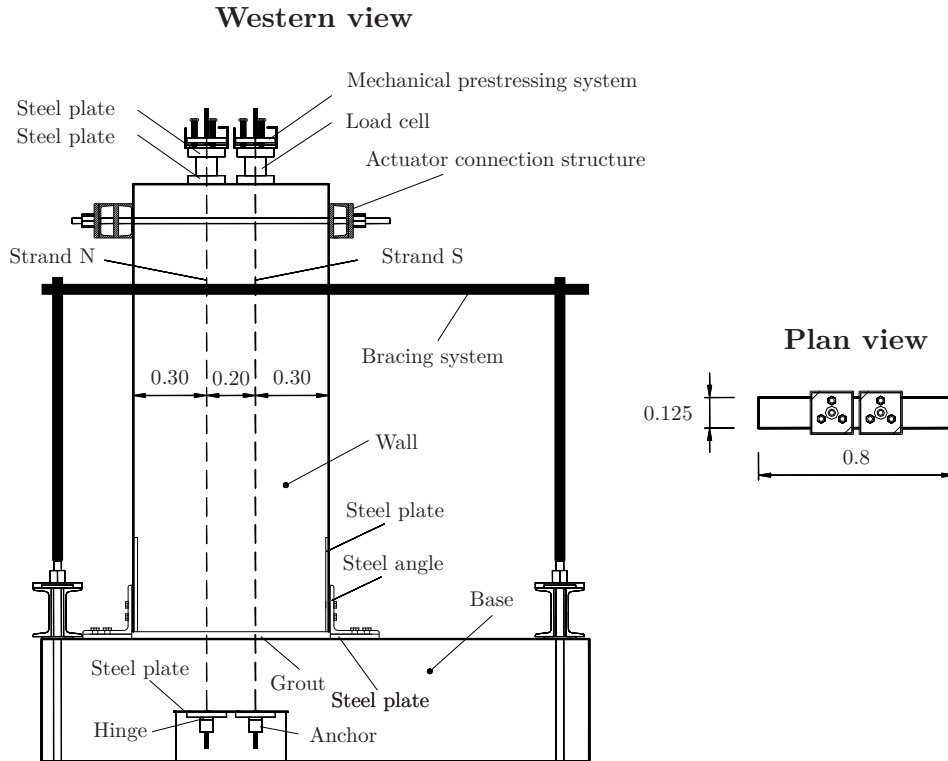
Western and plan views of wall specimen RM5 test setup.
